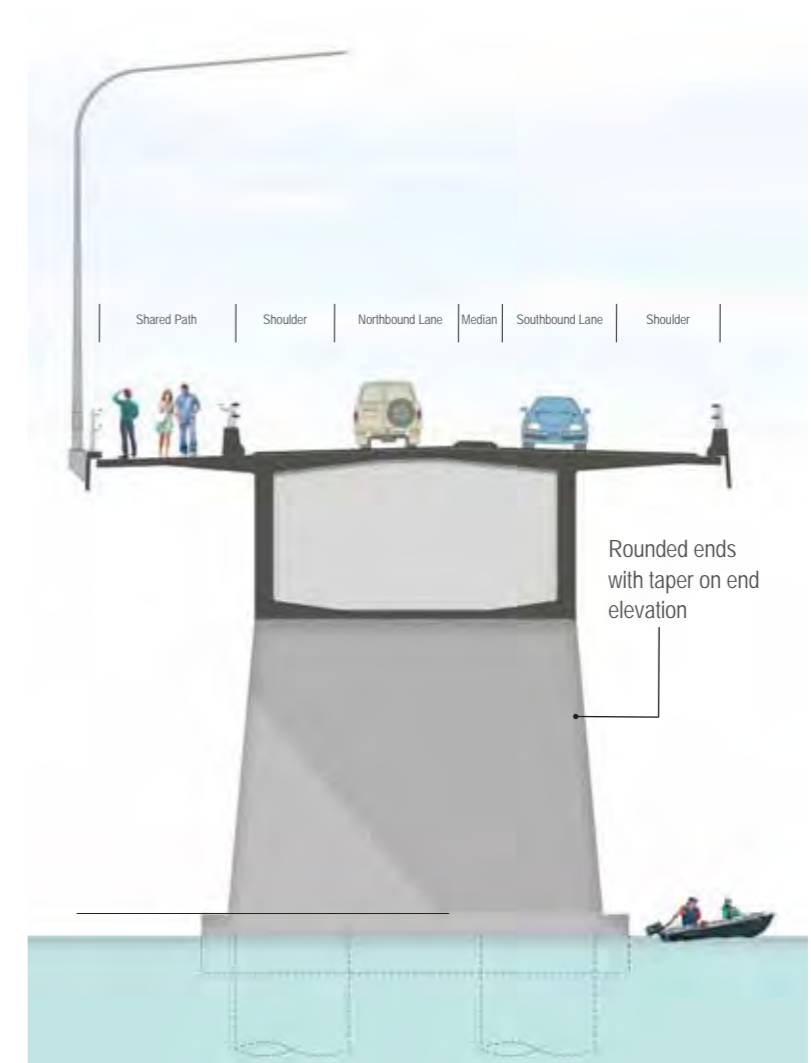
Additional bridge over Clarence River at Grafton - Shows integral pier type for the two most central spans (Scale 1:200)
